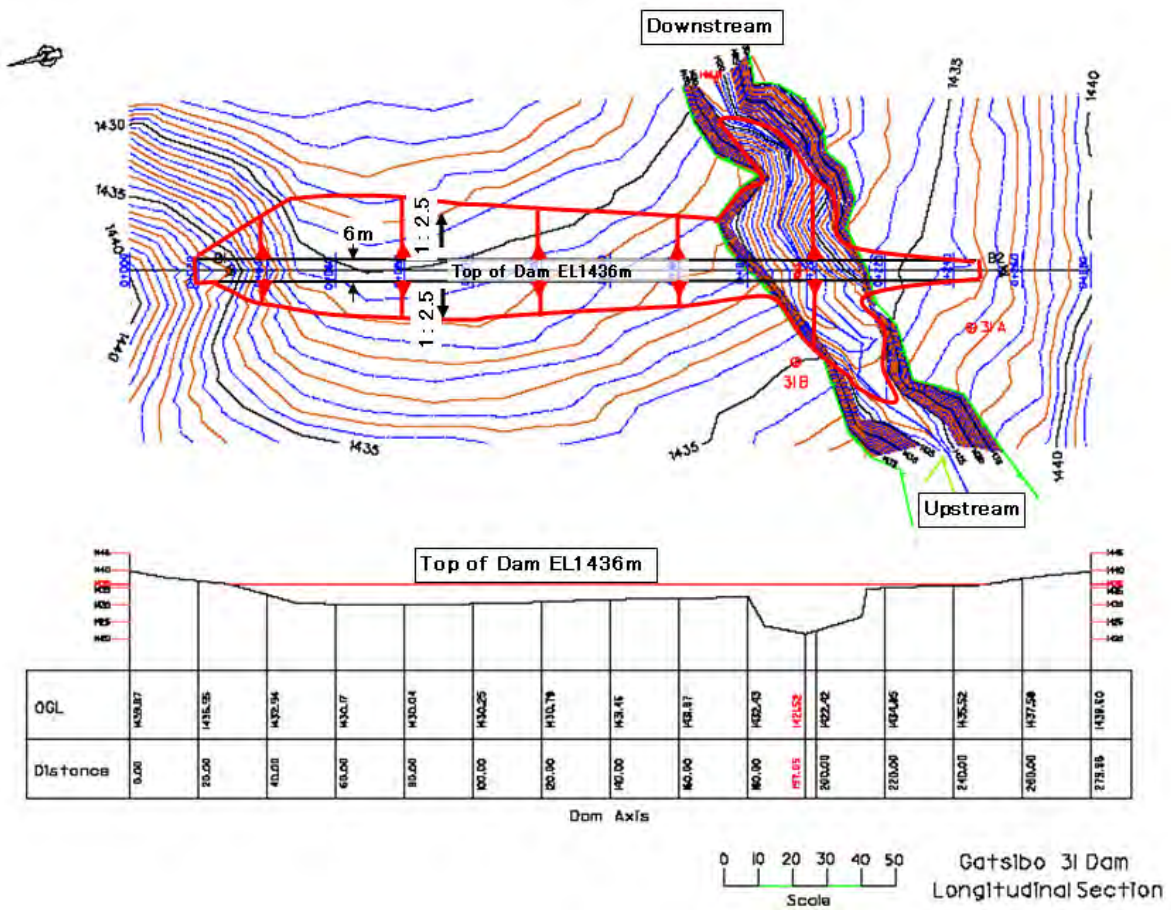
Longitudinal section and Plan of Gatsibo 31
